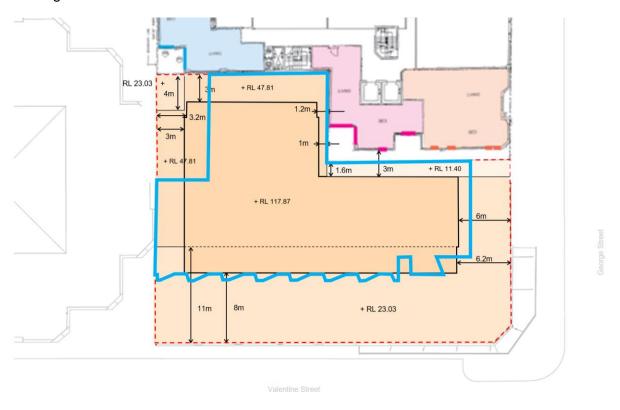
Plan detailing the planning envelope, shown in orange and black, setbacks and separation to affected Capitol Terrace apartments and windows, shown coloured, as compared to the court approved hotel on the subject site, shown in blue
